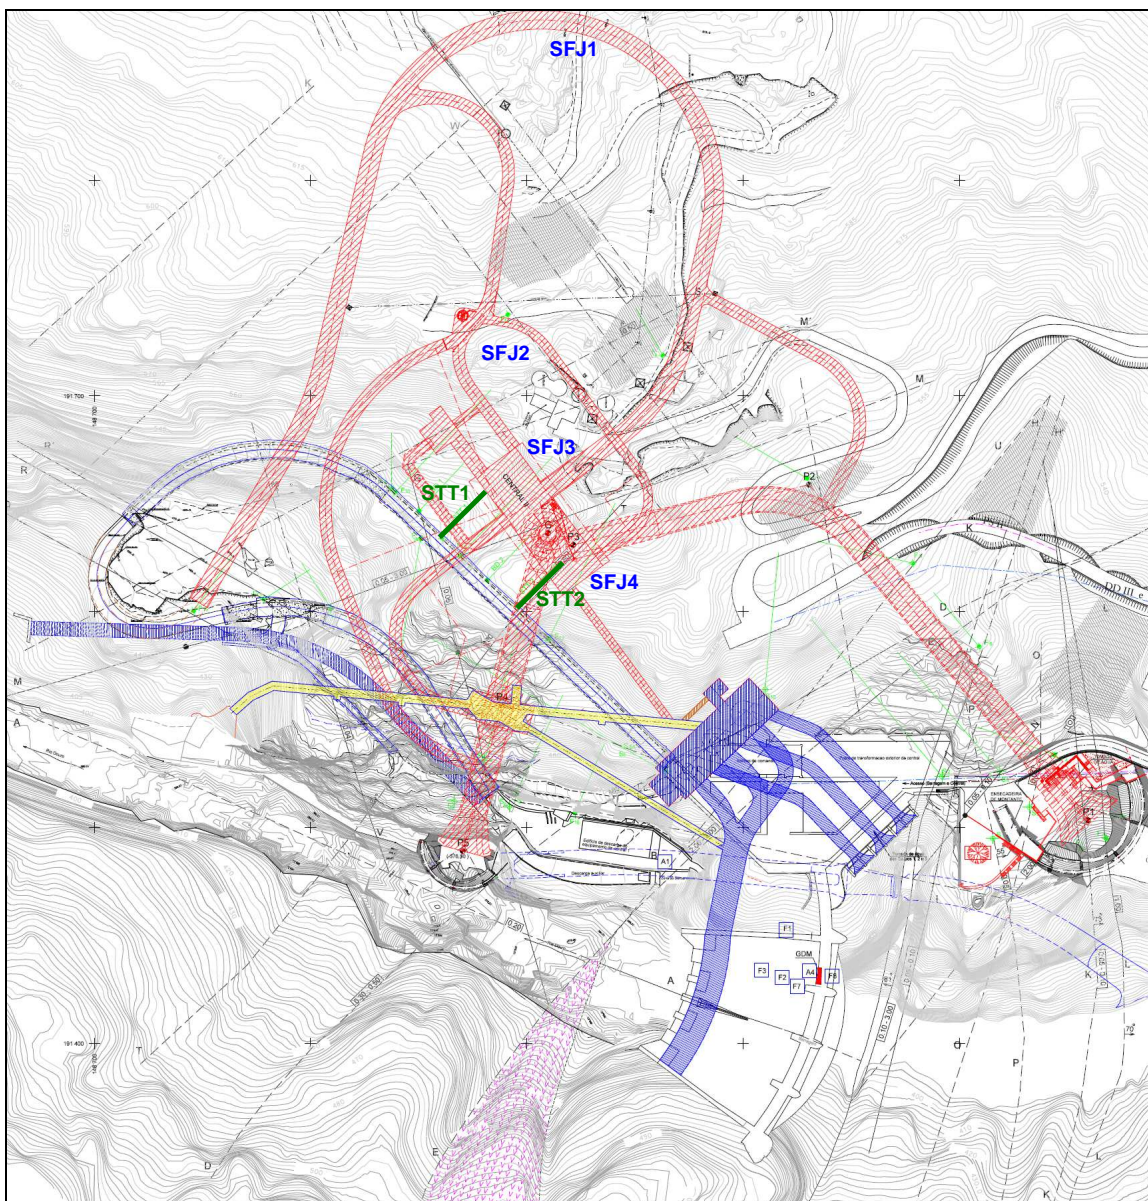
Layout of Picote hydroelectric scheme in blue, and the new the Picote II repowering scheme in red
